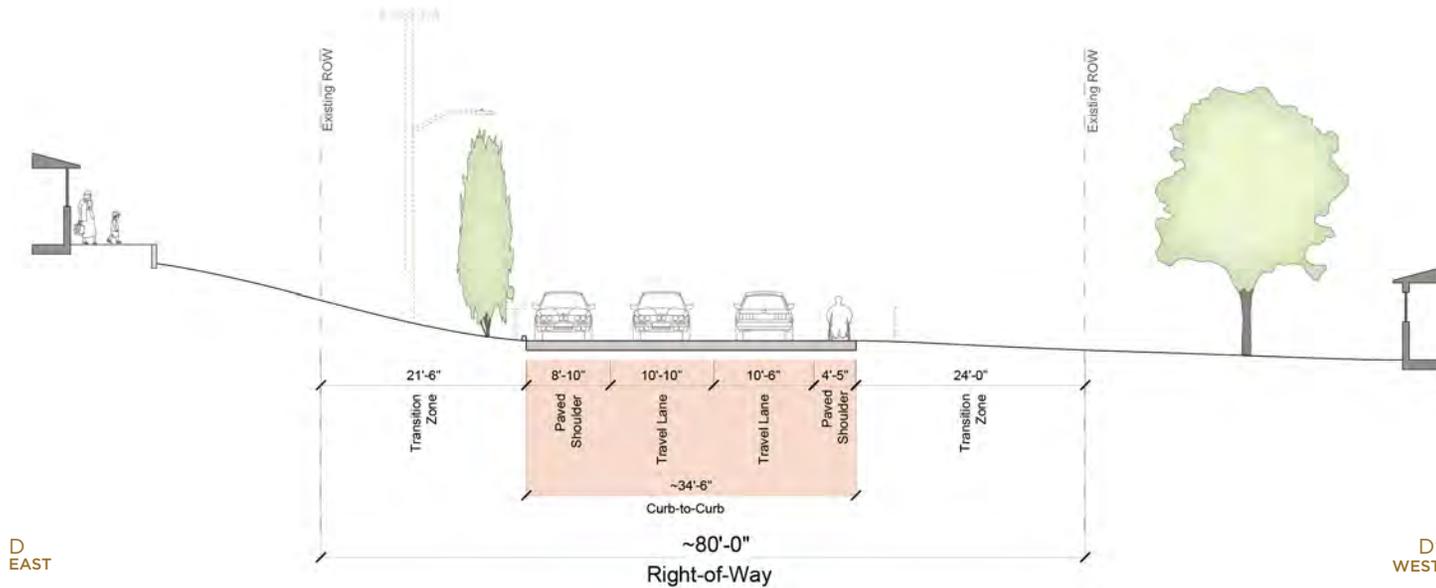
10th Avenue Segment D - typical cross-section
